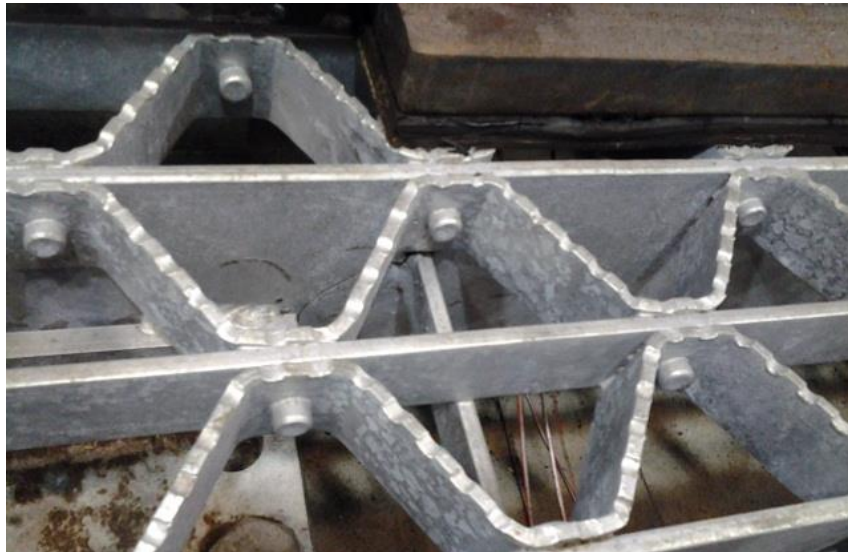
Shear (diagonal tension) cracks at weldment of 37R5-A1 (Test 3)
